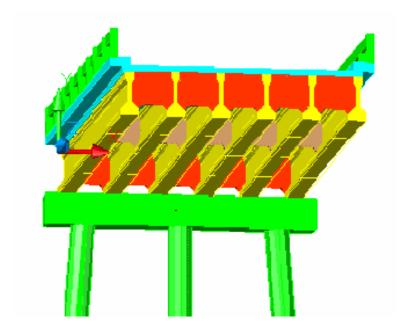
Structural geometry of I-10 Bridge over Escambia Bay
